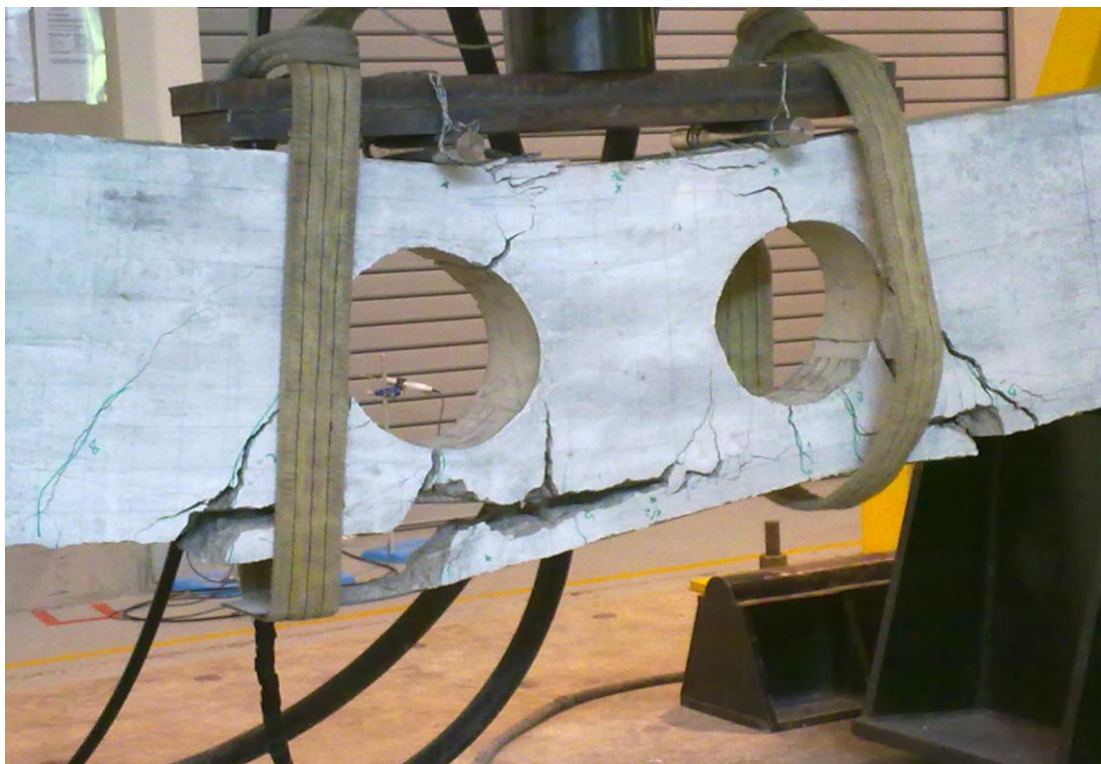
Failure of Beam with Circular Opening with CFRP Sheets Subjected to Static Load
